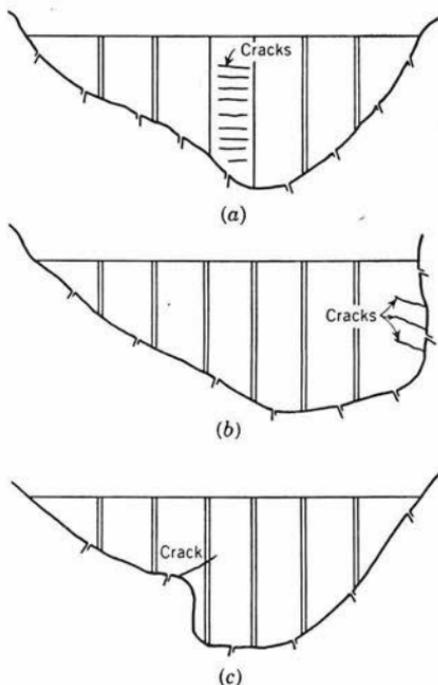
Norwegian experience with arch dams in U-shaped valleys shows three construction procedures to be avoided: (a) pouring a section without contraction joints, (b) pouring a section against vertical rock face, and (c) allowing foundation rock to project into dam.
